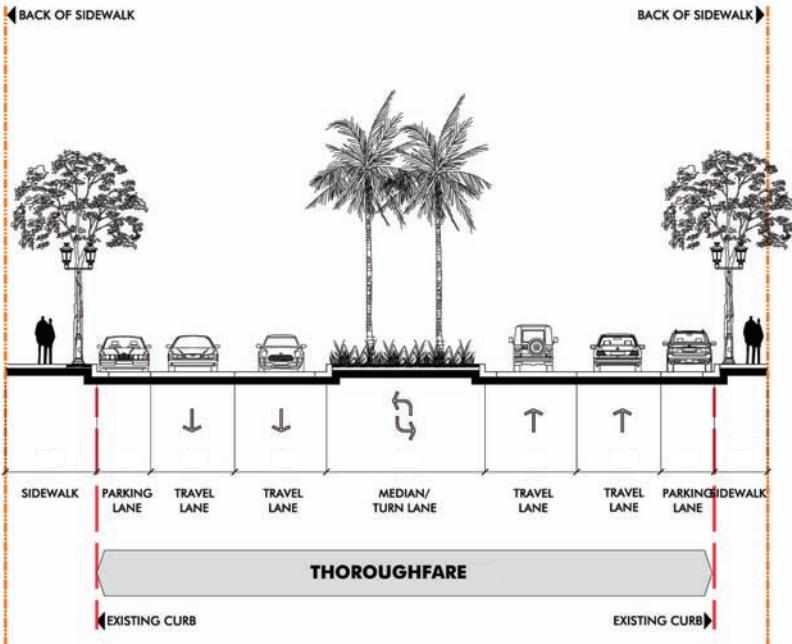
C.4: POTENTIAL CONCEPT STREET SECTIONS
